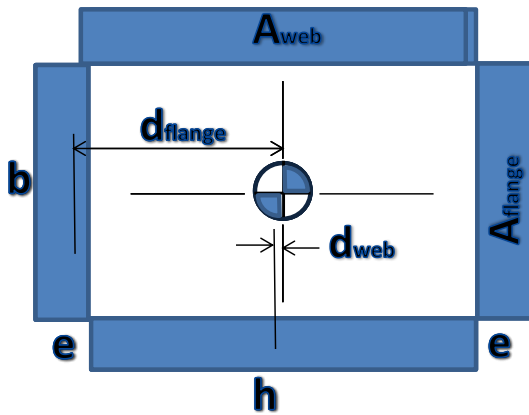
Post-to-Base Weld, Concept AW2-C
